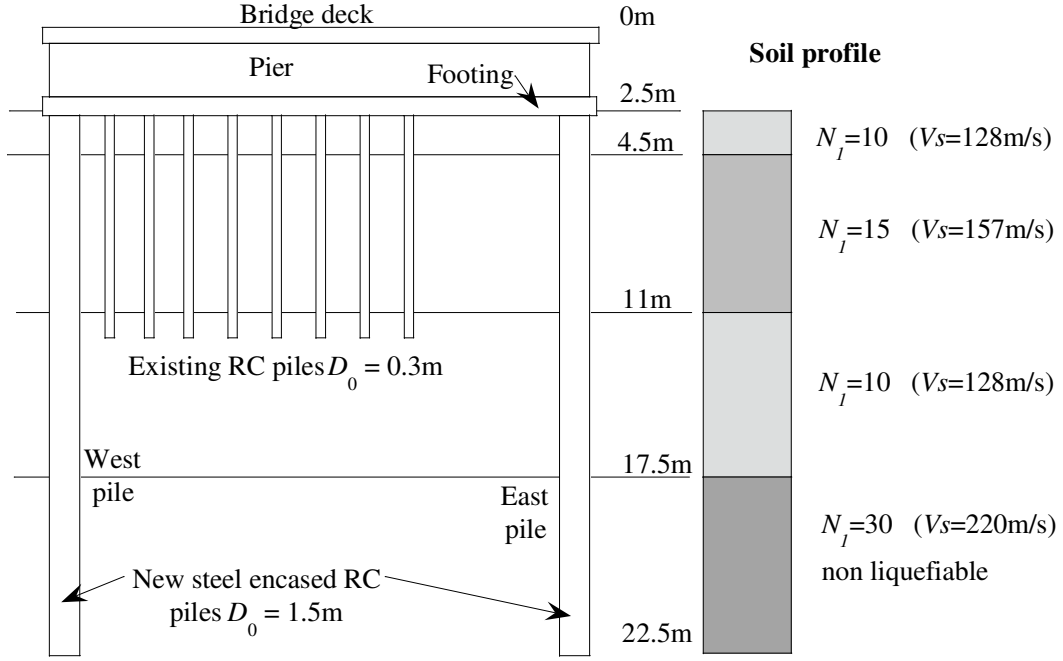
Central pier of bridge: (a) Foundation layout, (b) soil properties used in analysis
